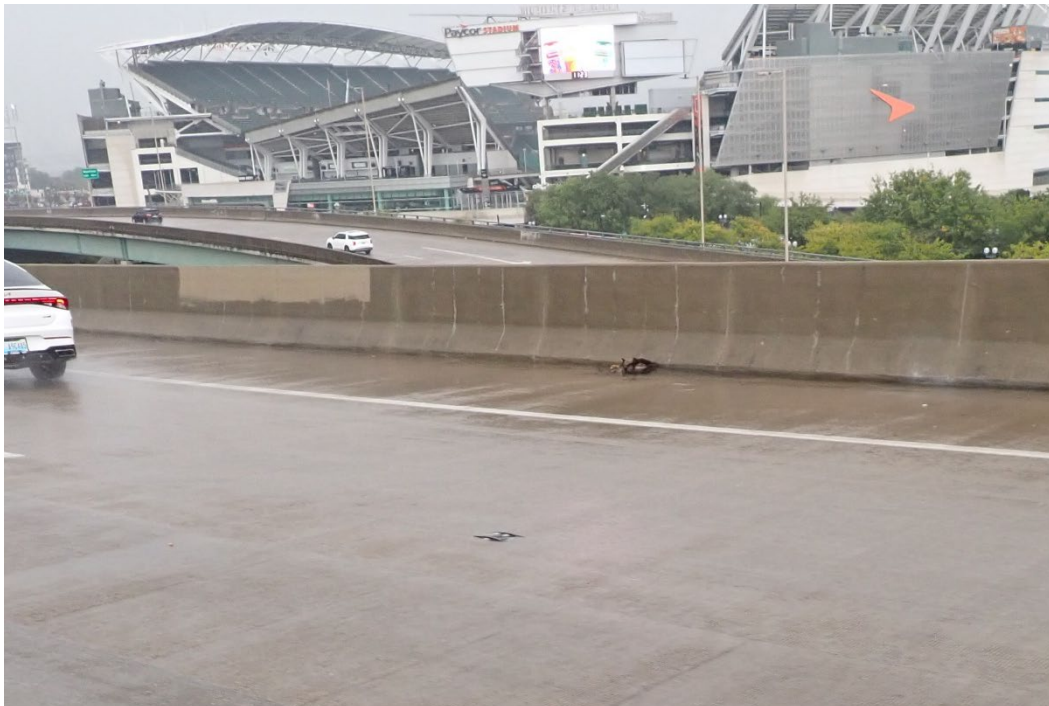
Hairline vertical cracking with efflorescence spaced approximately 1' to 3' along concrete bridge railing. Note: concrete patch repair to top of railing, looking south.
